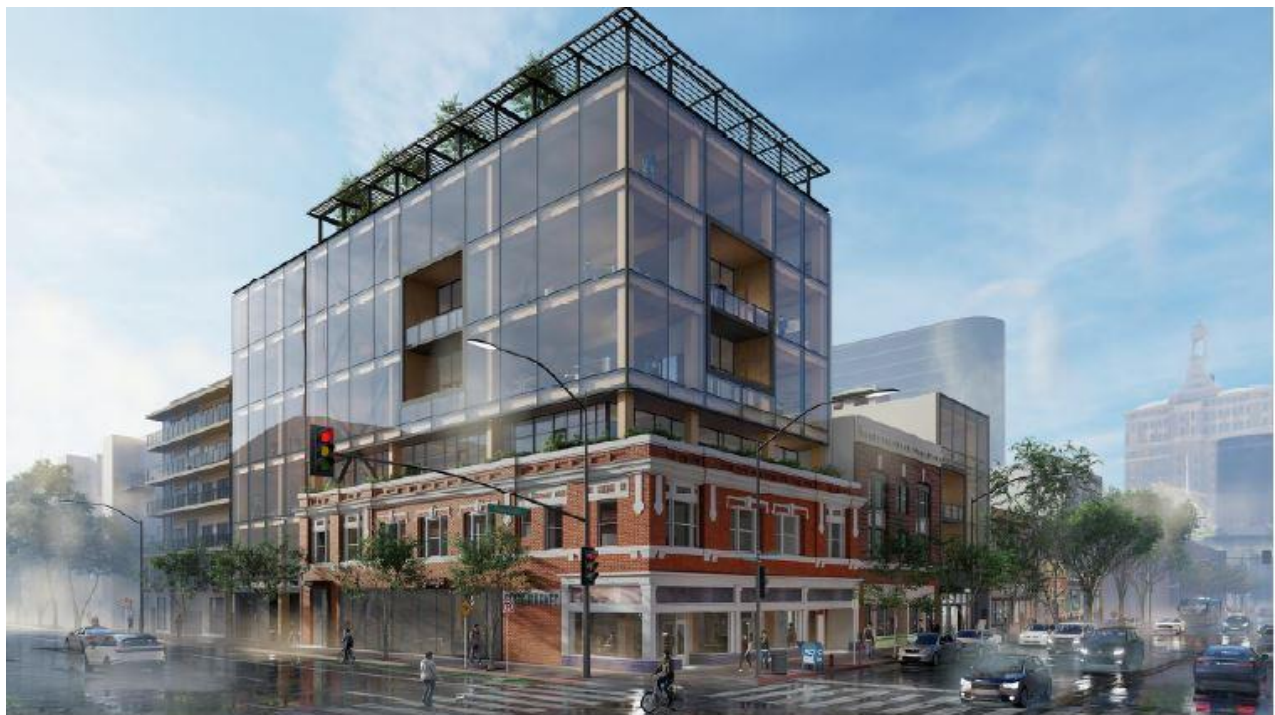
Project as viewed from the corner of East Santa Clara and South 4<sup>th</sup> Streets
